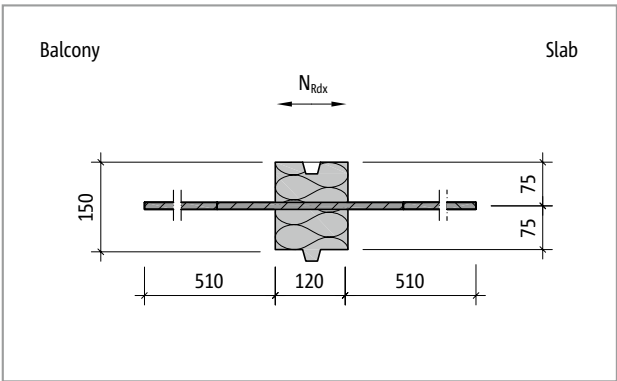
Schöck Isokorb® XT type H-NN2: Product plan view
